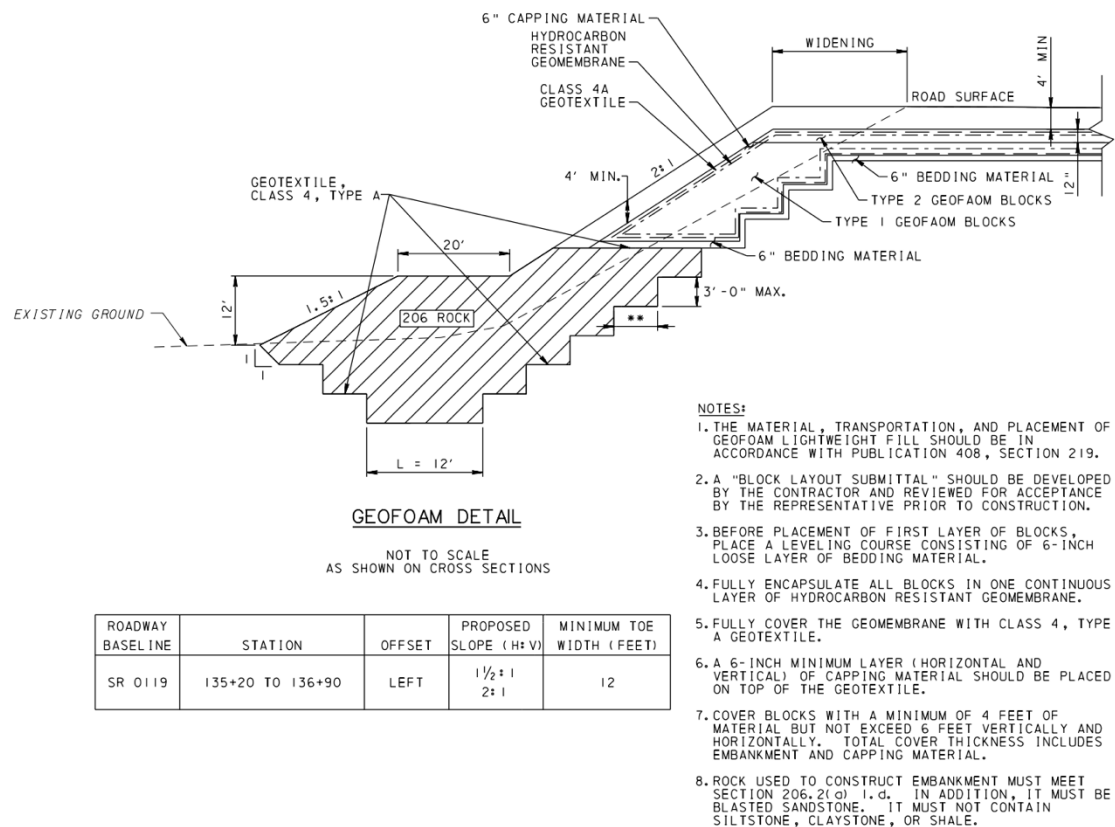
Typical embankment cross section with Geofoam details for S.R. 0119, Section 559.
